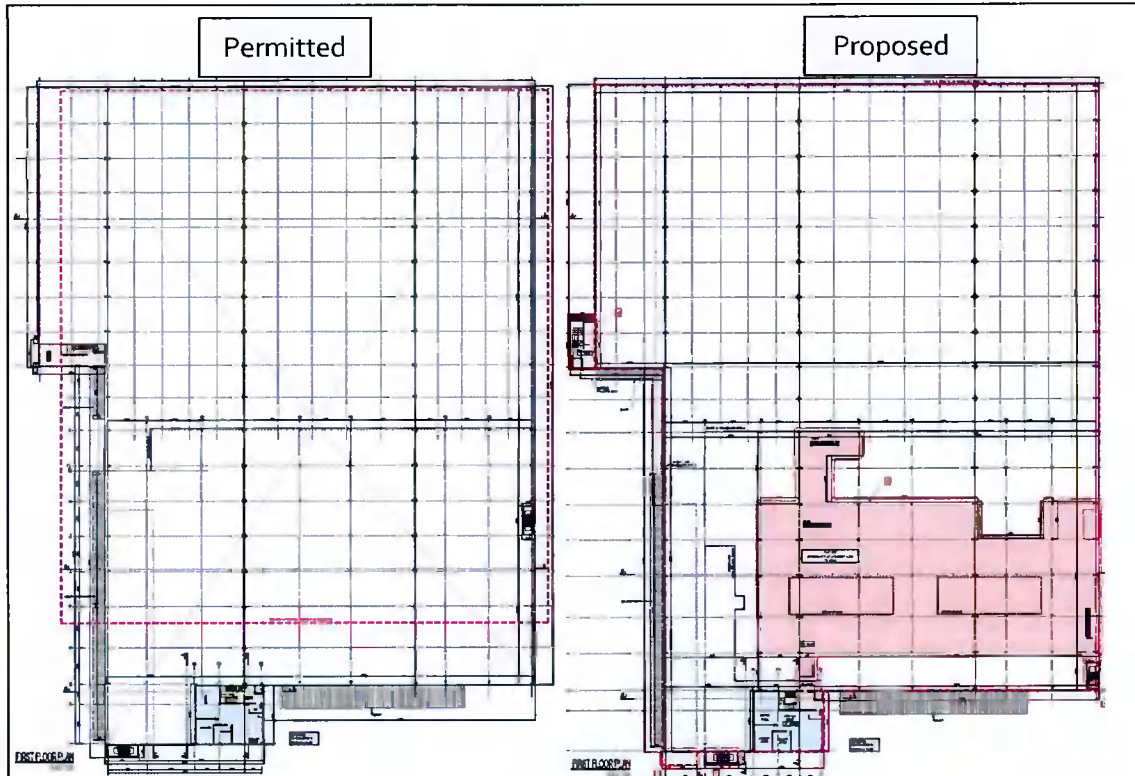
Permitted (SD21A/0200) and Proposed First Floor Plans
